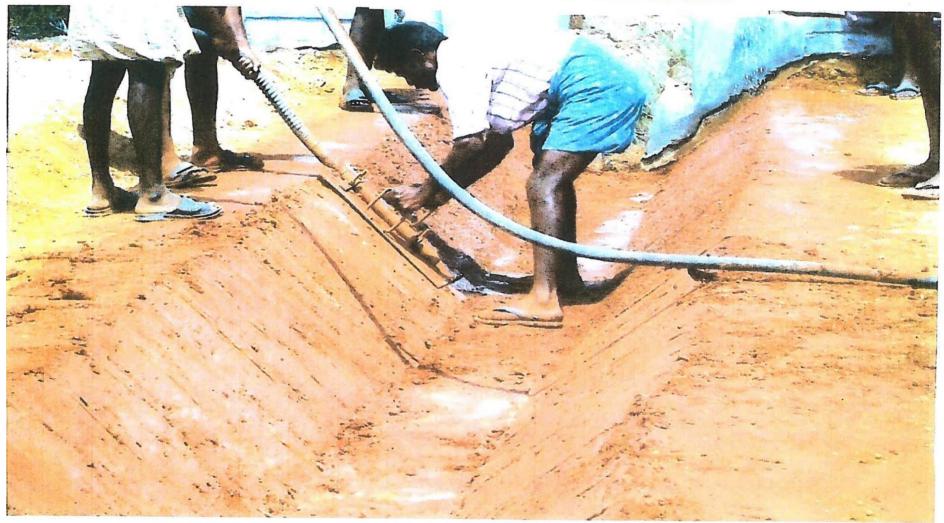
Depicting Contraction Joint Grooves To Be Provided In Concrete Lining.
